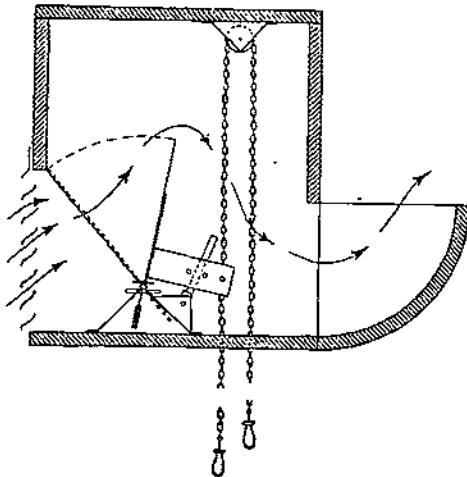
Automatic intake with horizontal-axis type of valve
